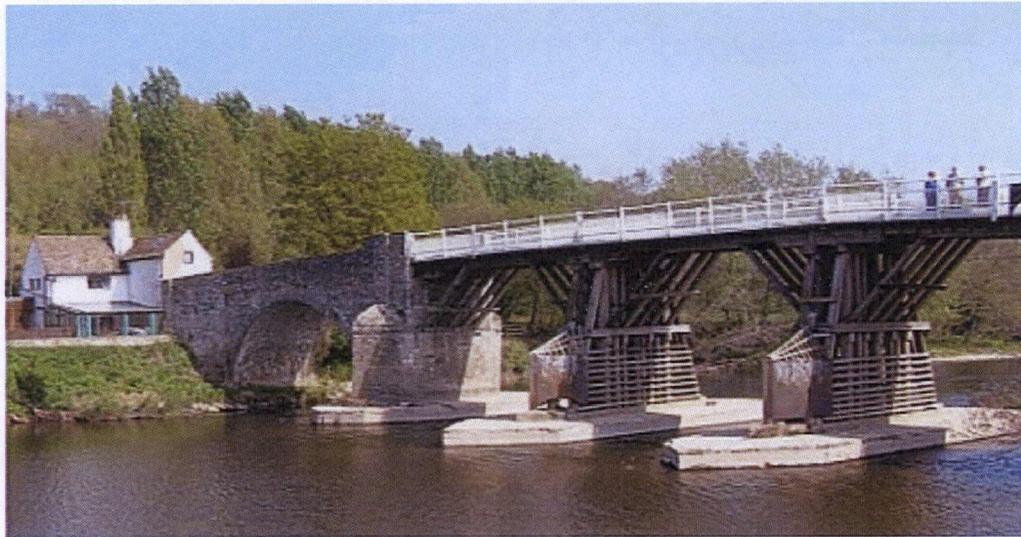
The Whitney-on-Wye Toll Bridge looking East
